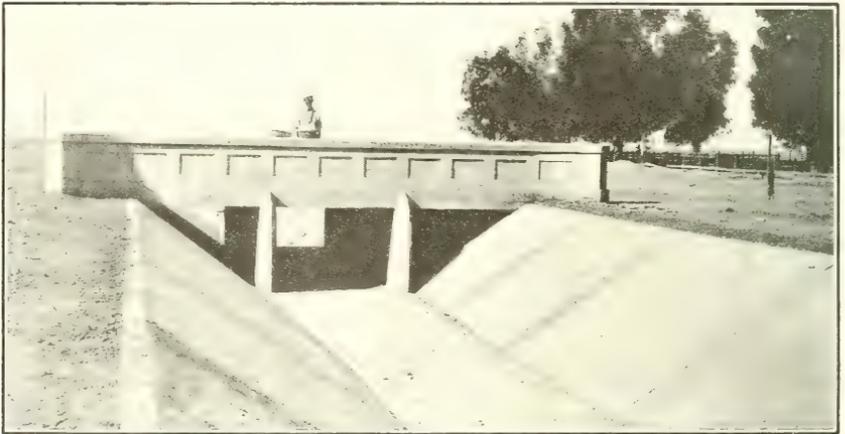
CONCRETE-LINED CANAL OF THE EAST CONTRA COSTA IRRIGATION PROJECT, BRENTWOOD, CAL.
